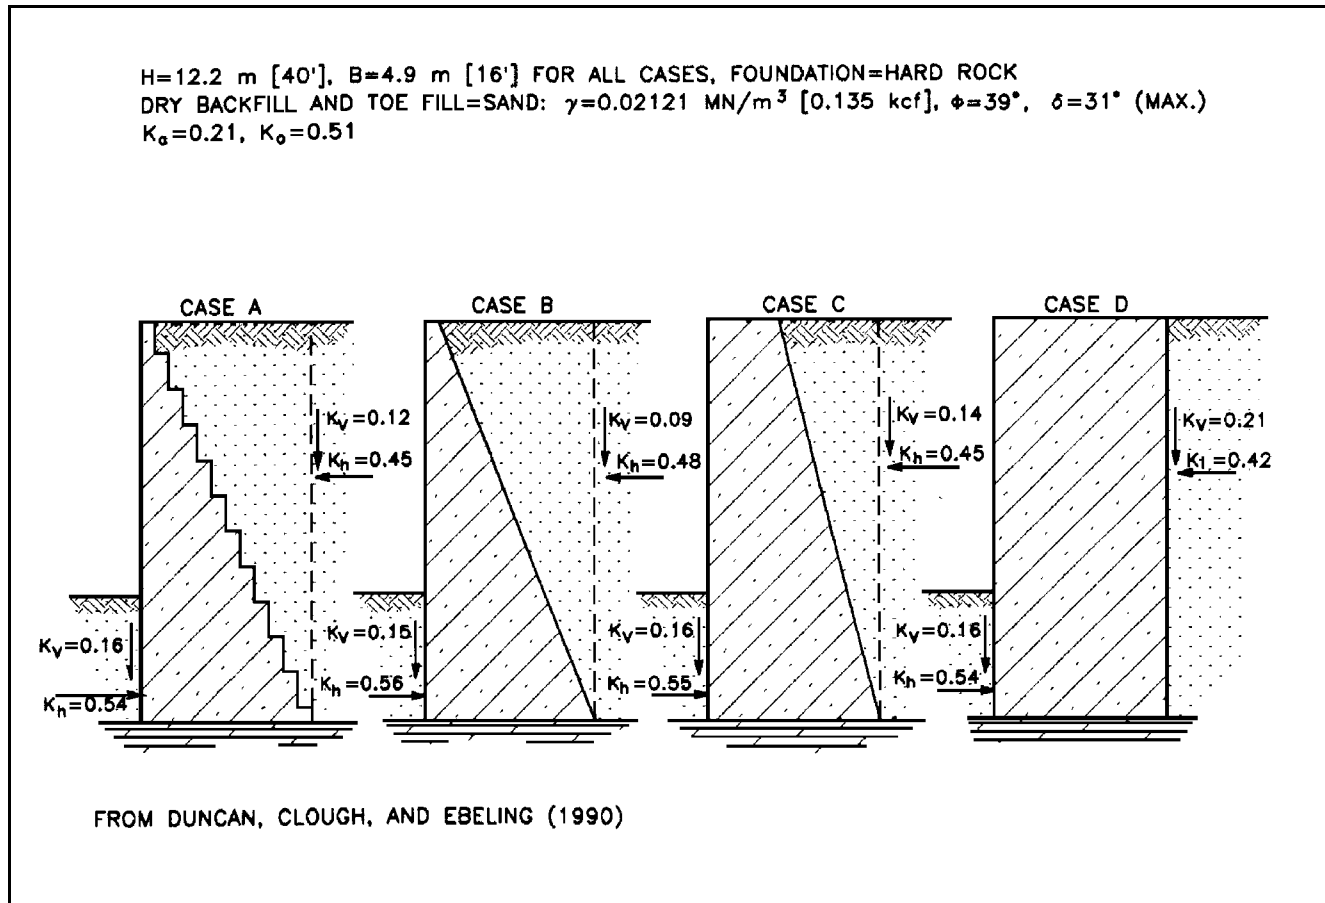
Results of finite element analyses of four walls founded on rock-retaining dry backfill
